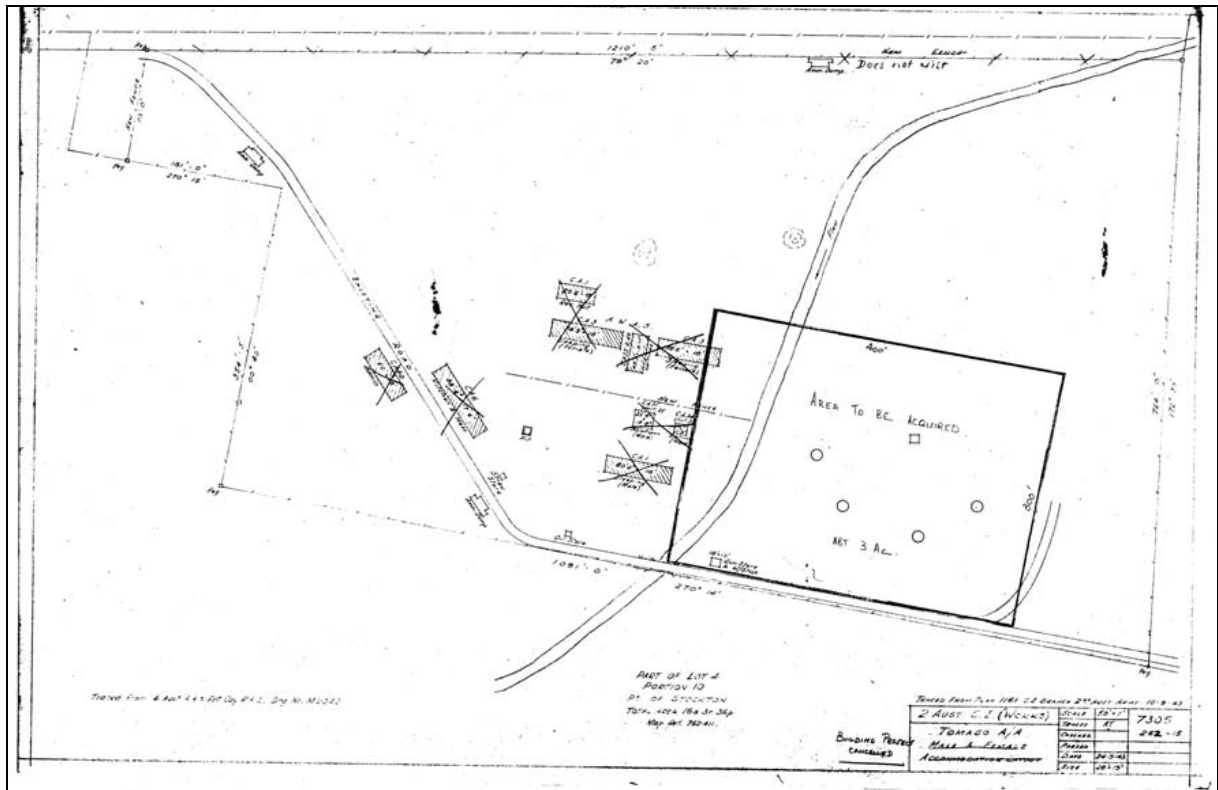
1943 plan of anti-aircraft gun emplacement site, indicating existing structures and cancelled new building project from EJE report
